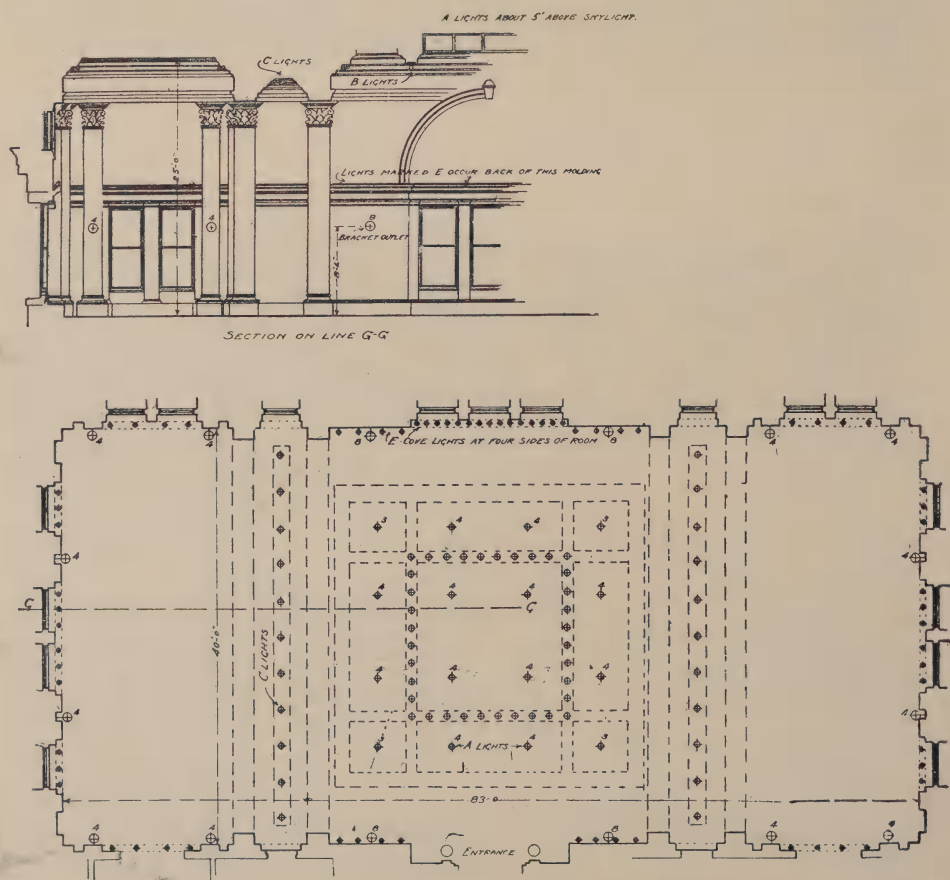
LIGHTING PLAN, NORTH AND SOUTH COURT ROOMS, FEDERAL BUILDING, CHICAGO.
